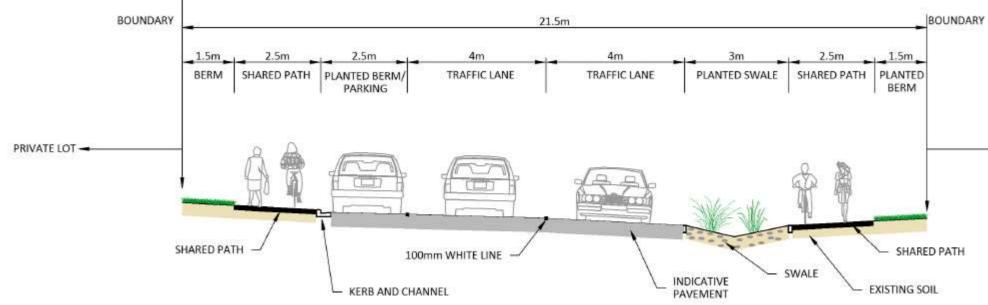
Ohinewai Structure Plan - Road cross sections – Local Roads (Business and Industrial Roads)
